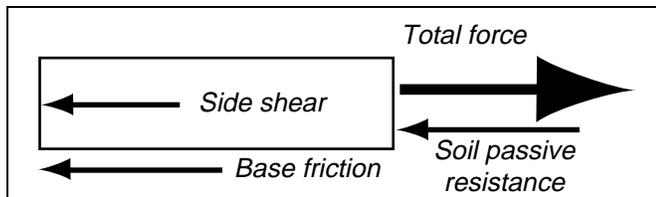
Footing Lateral Stiffness and Capacity Components
